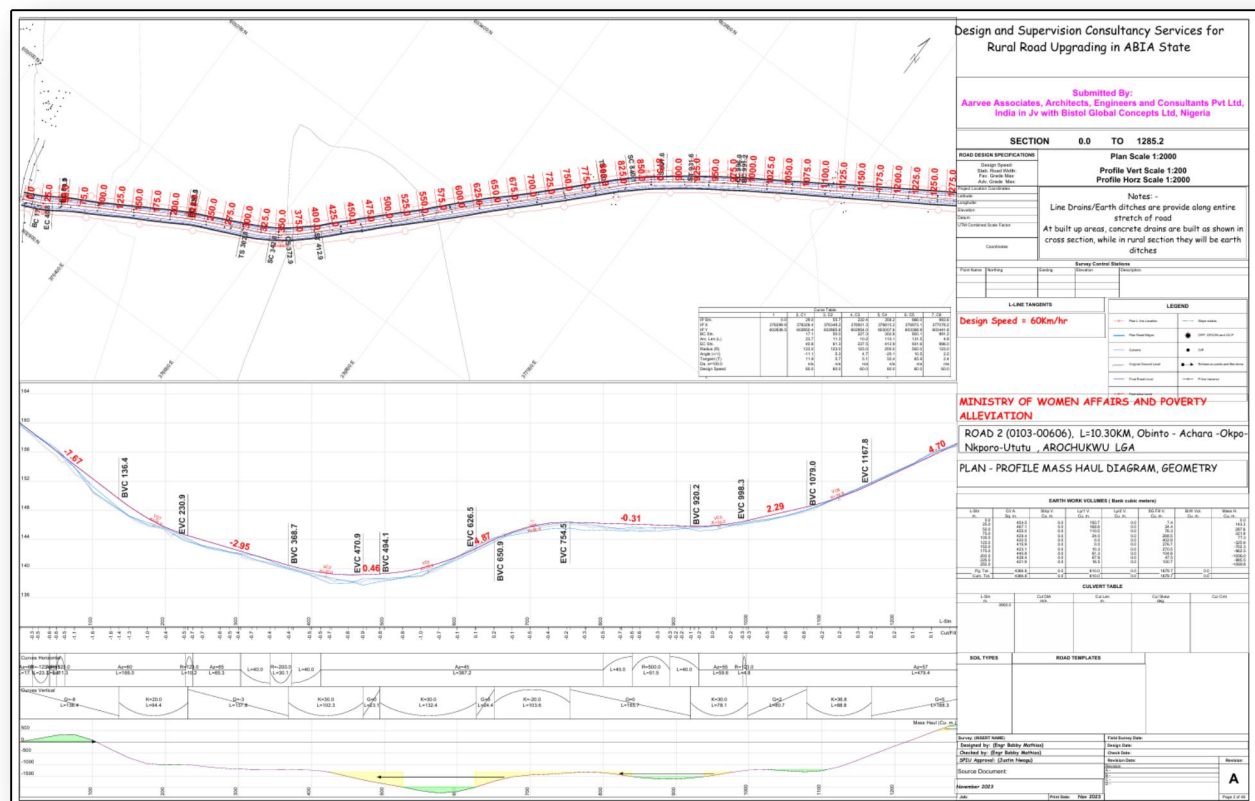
Upgrade Engineering Design A - Plan - Profile Mass Haul Diagram, Geometry
